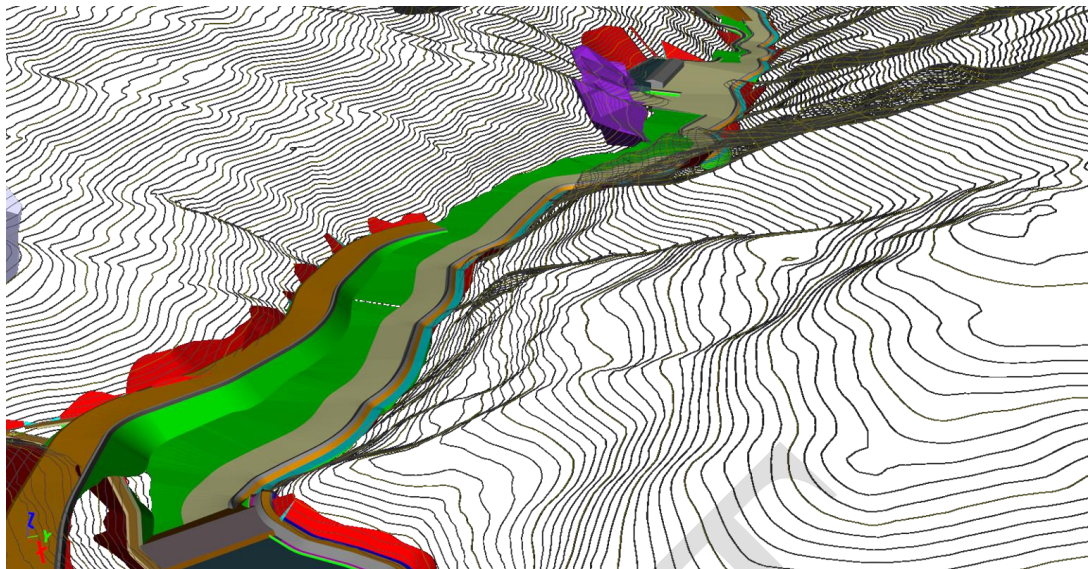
Shepherds Valley Infill from Shepherds Silt Pond to the Underground Portals, looking northwest
